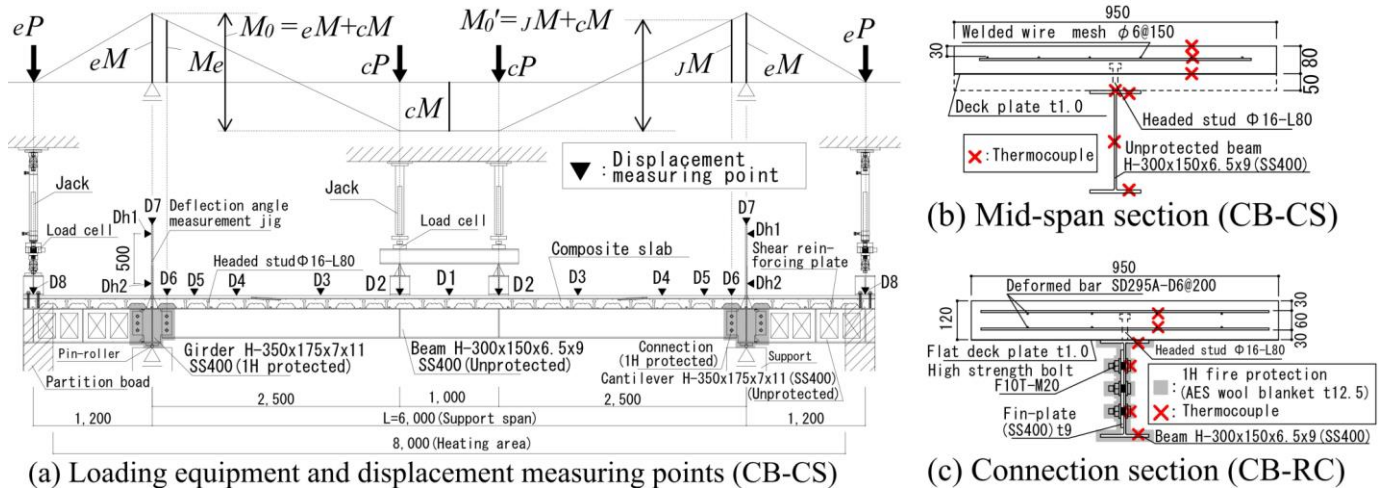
Shape of specimen, loading equipment and measurement points (Dimension unit: mm)
